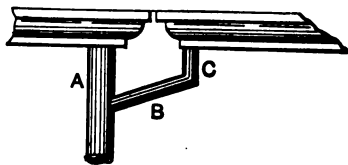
Method of Connecting Two Eave Troughs with a Leader by Means of a T-Joint.
